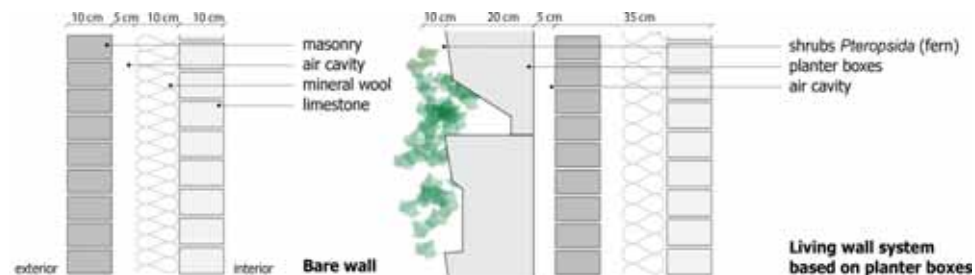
Insulated cavity wall with a living wall system based on planter boxes.
